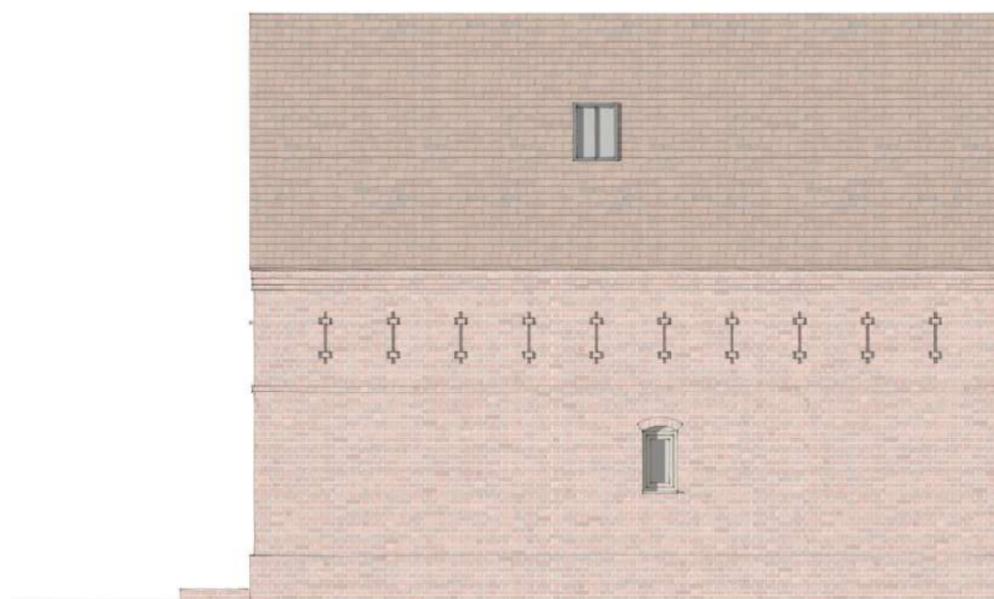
Sample Proposed Elevations - Plot 1 (detached brick barn)
